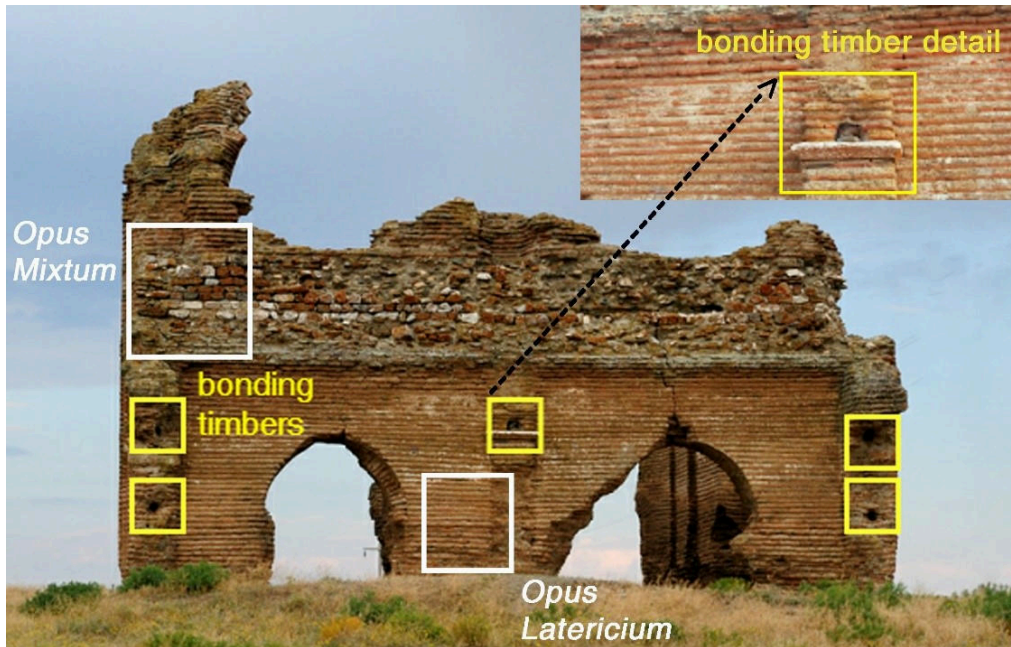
The bonding timbers in between the masonry brick wall and brick quality samples on the west façade
